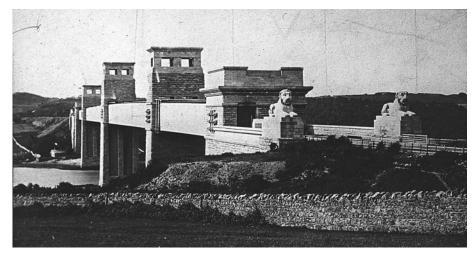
Britannia Bridge (UK). Engineers William Fairbairn and Robert Stephenson (Photo IBK, ETH – Zurich).
